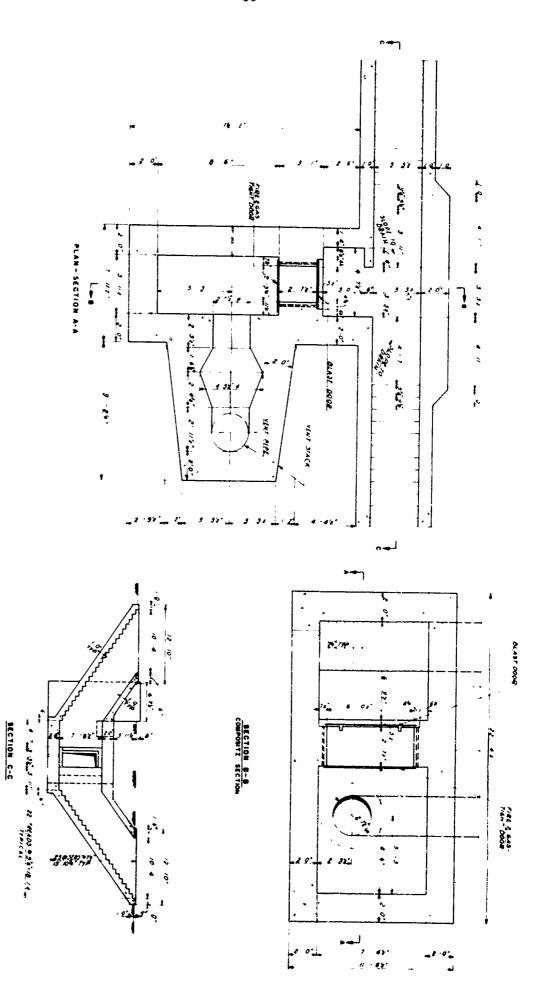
Entrance and entrance chamber, structure II-4, architectural layout.
